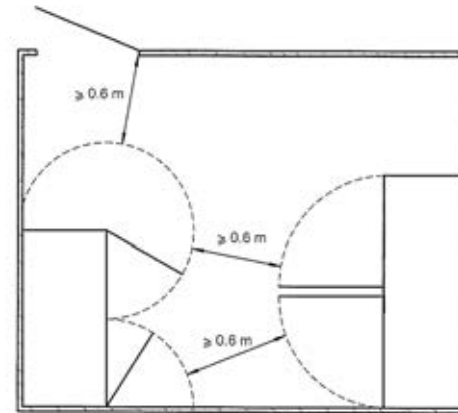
ACCESS TO SWITCHBOARDS—
